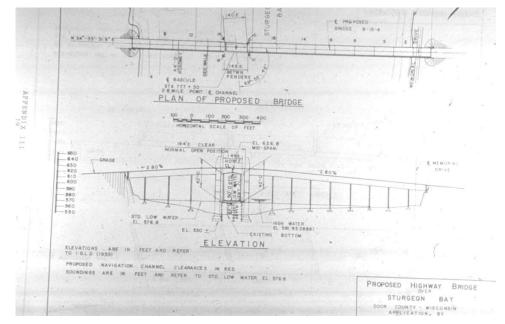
Typical "Permit Drawing" Showing Channel Width and Underclearance in Closed and Open Position
